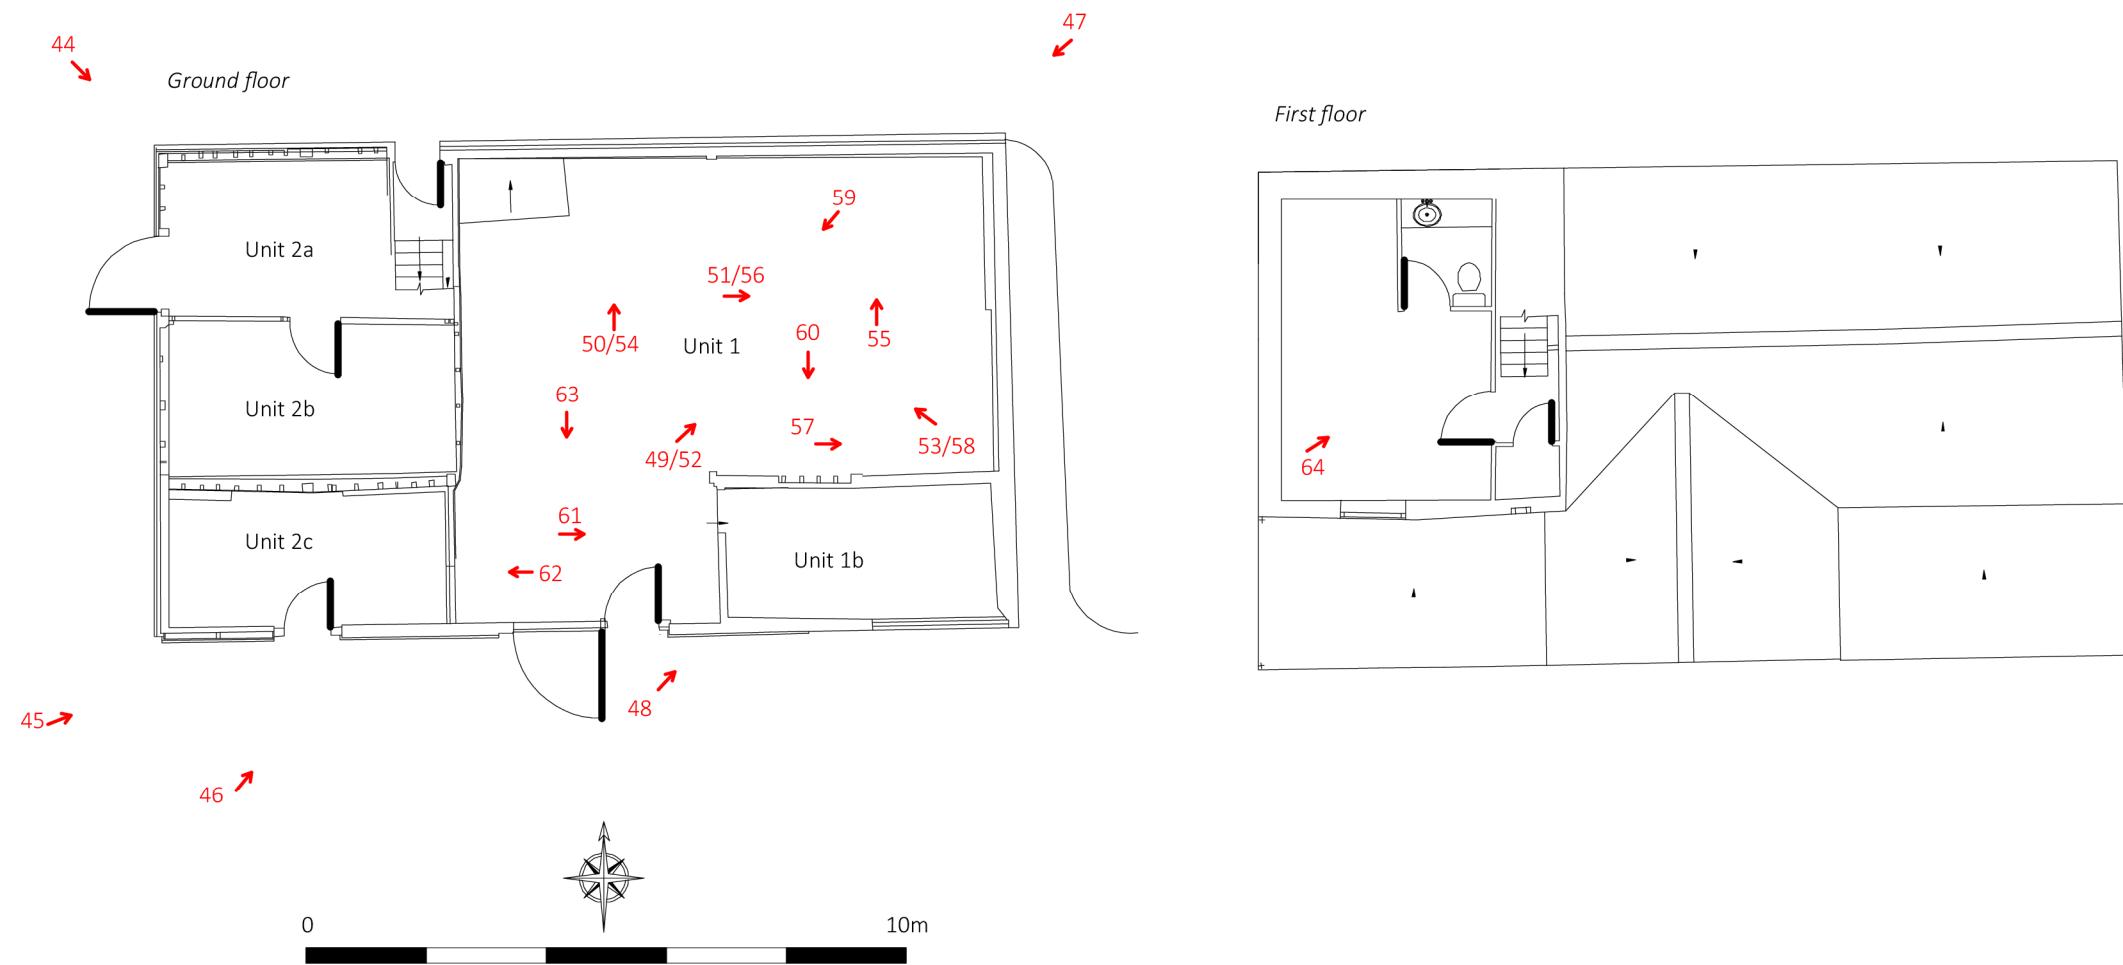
Barn 2 existing floor and photo plans (scale 1:125)
